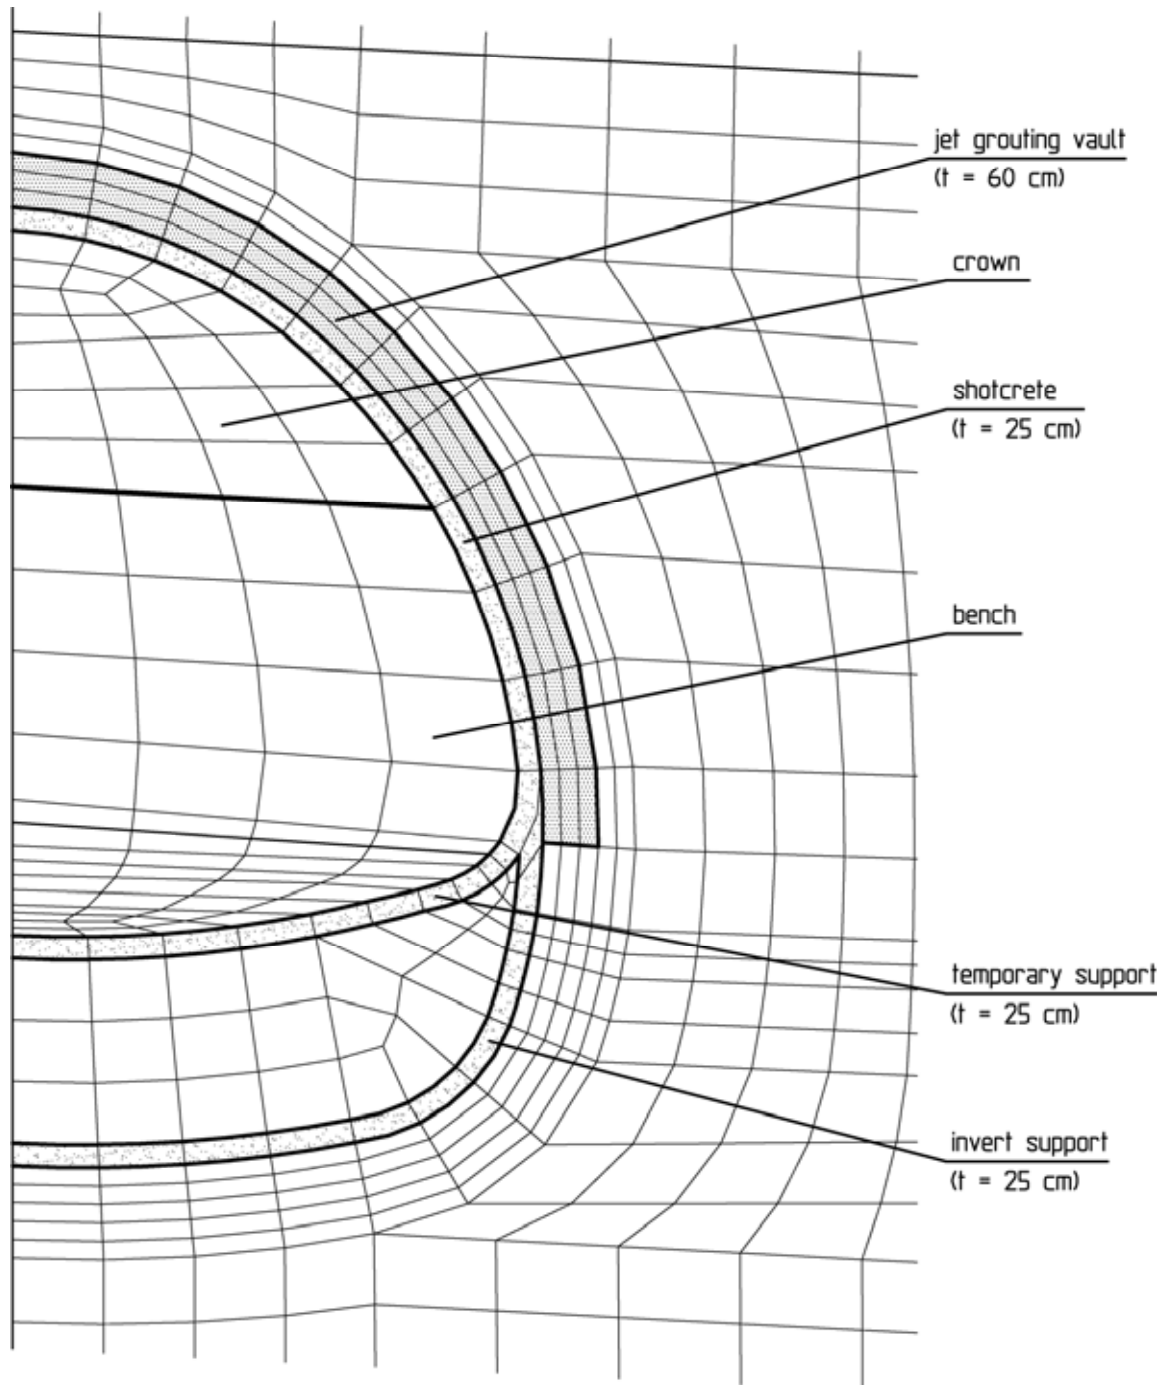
Analysis cross-section 2, FE-mesh, detail
